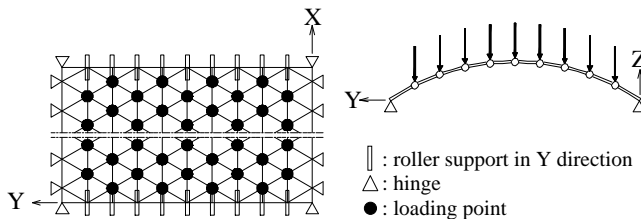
A pin-supported cylindrical latticed roofs under uniform vertical loading
